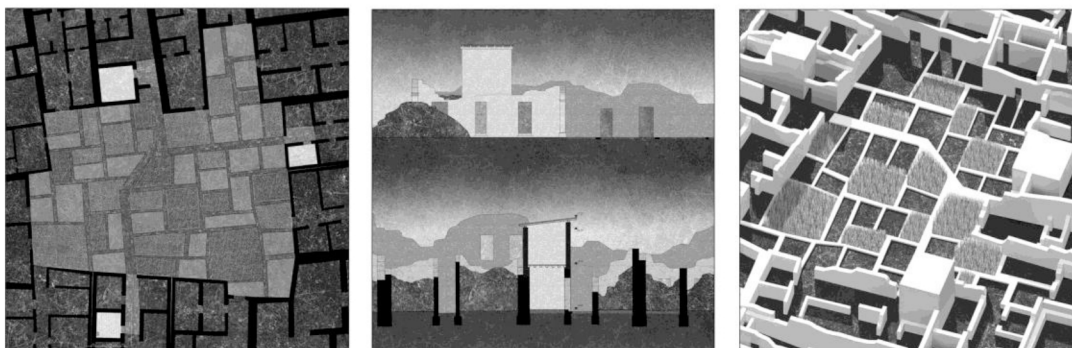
Layout, Section and 3D siteplan of the Shelter (Anna Petrovicz, Zsuzsanna Péter)
